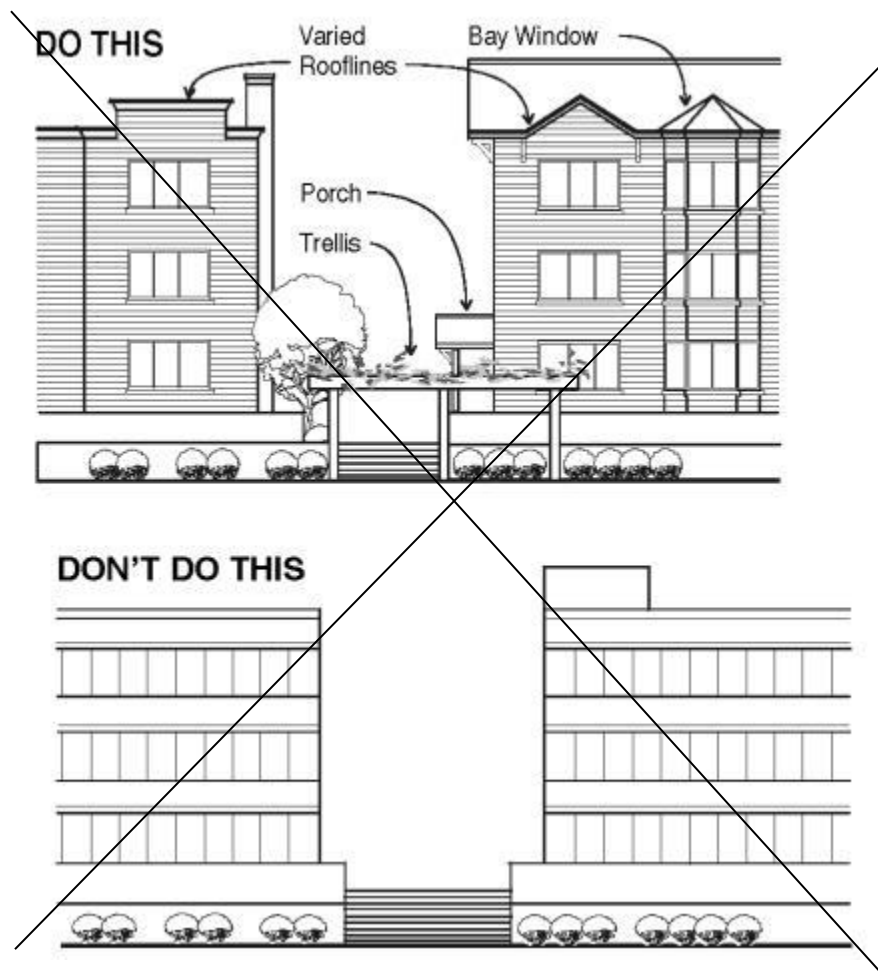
(A): These two projects point out the importance of architectural elements. They are essentially the same building envelope except that the upper example employs varied roof lines, window details, facade articulation, a trellis, chimneys, entry details and other features that reduce the “visual bulk” impact of the facade.
